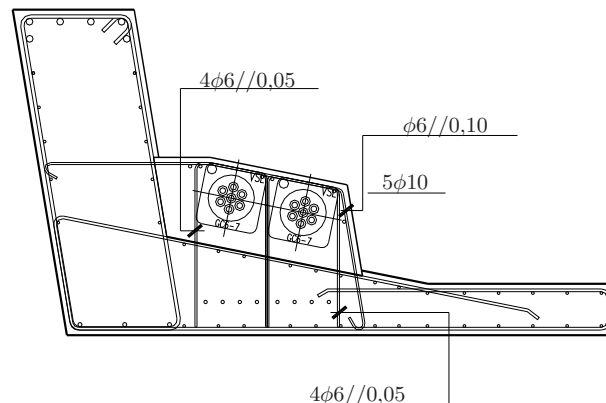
Reinforcement in the blister anchorage zone - Cross section
